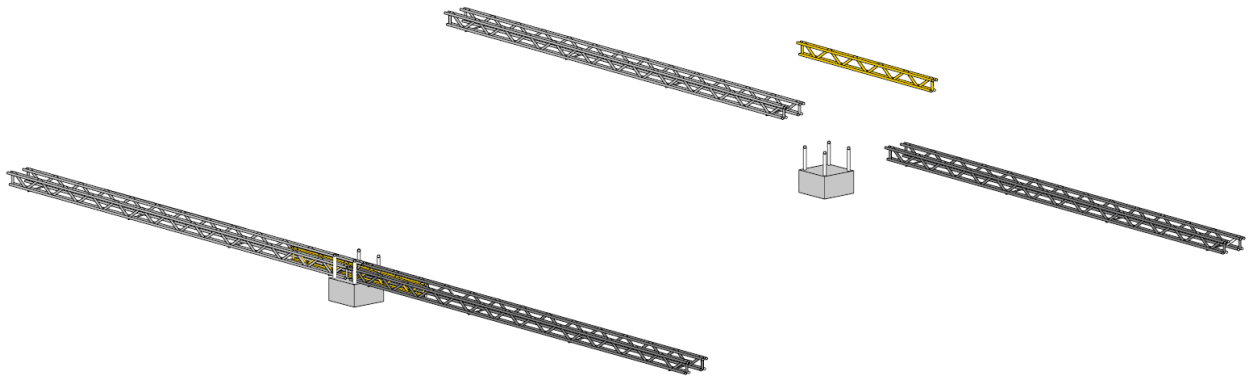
Additional steel truss for the connection at nodes between two CSTC beams NOR.
